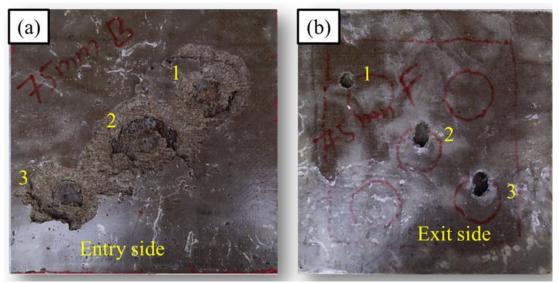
JEFRC sandwich 75mm thick impacted with projectile (a) entry side, and (b) exit side damage
